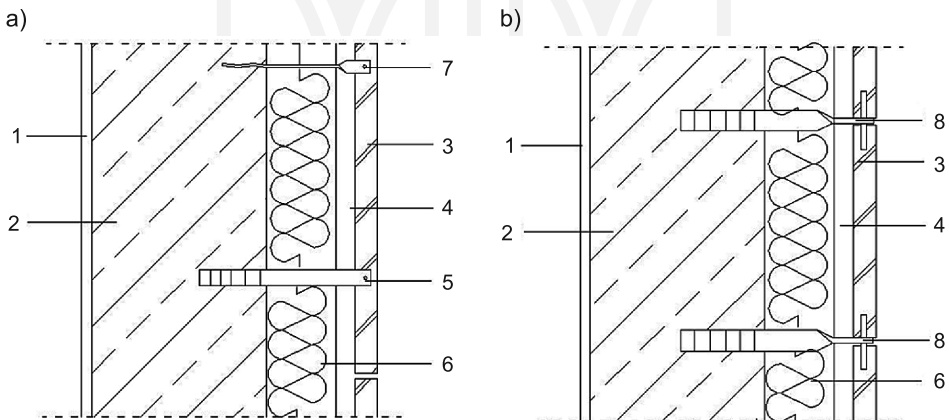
Schemes of stone slabs connected with steel anchors: a) slabs fixed on the vertical edges, b) slabs fixed on the horizontal edges. Markings: 1 – interior plaster. 2 – construction layer, 3 – stone cladding, 4 – air void, 5 – bearing anchor fixed in the vertical joint, 6 – thermal insulation of the wall, 7 – stabilization anchor, 8 – bearing anchor fixed in the horizontal joint
